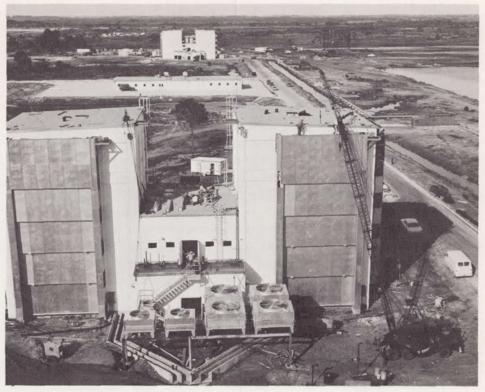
Hypergolic building, fluid test complex, Merritt Island industrial area, under construction. The large doors were raised in sections, giving access to two large test chambers, which were served by common facilities in the lower, center section. Liquid and gas lines would enter the building in the concrete conduits beneath the fans.
